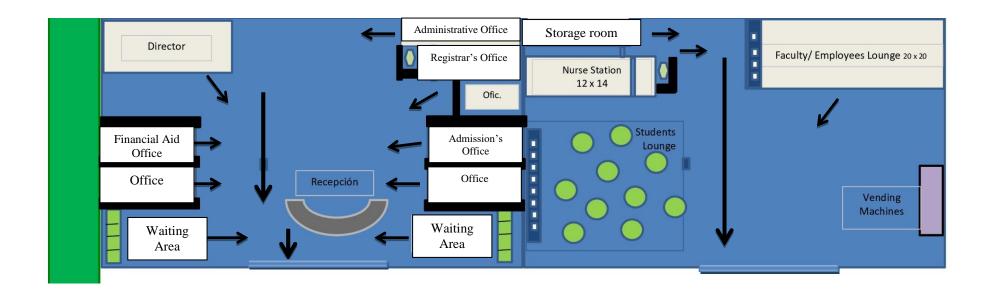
Emergency Exit Plan, Building C-2, First floor Administrative Offices and Student Services (C-105 & C-106)
